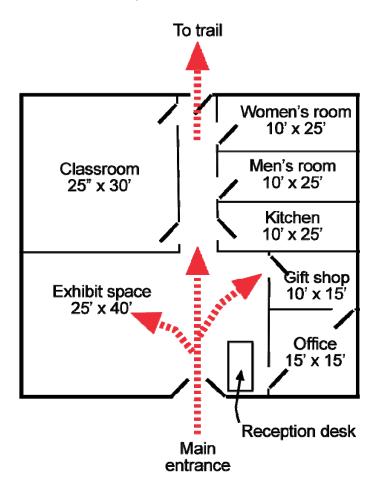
Recommended nature preserve building layout for high level of development. The red dashed arrows indicate visitor circulation through the building.
